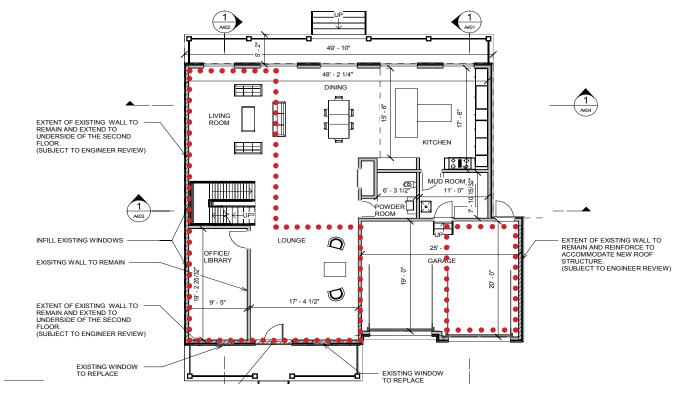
Ground/First Level Floor Plan. Red dotted lines indicate location of original residence (footprint) to be incorporated into proposed addition/renovation. Drawing by Third Layer Architects, 2021.
